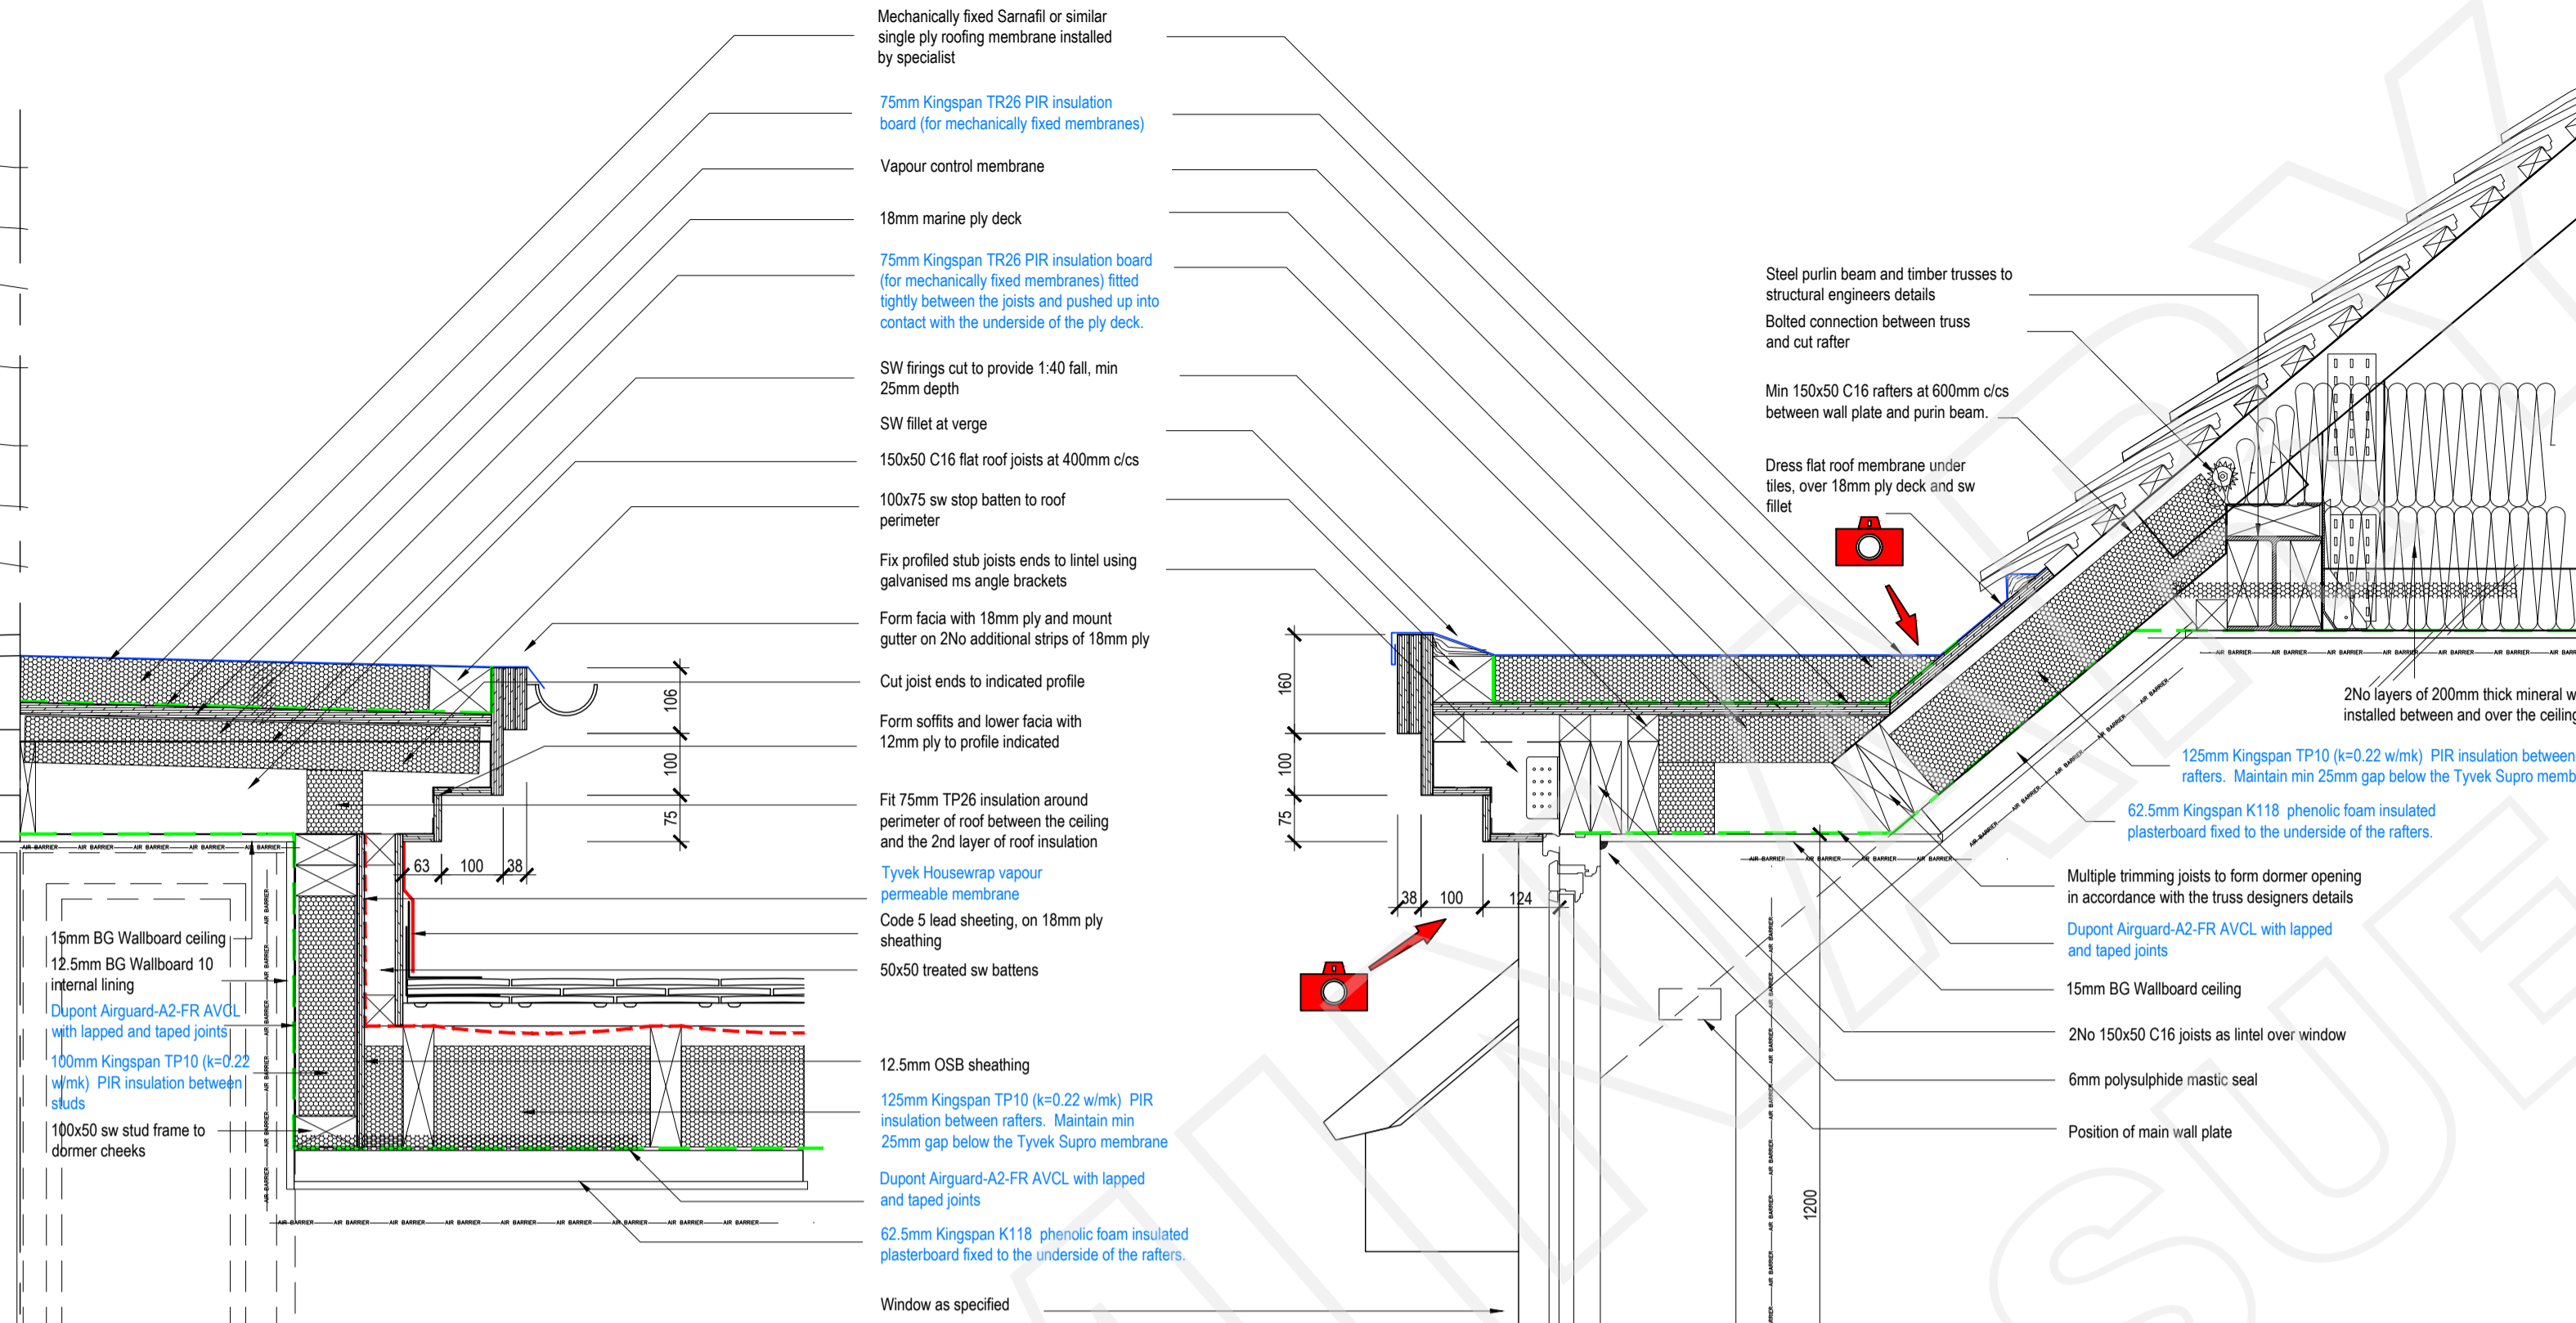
LOFT ROOM - DORMER WINDOW CONSTRUCTION
